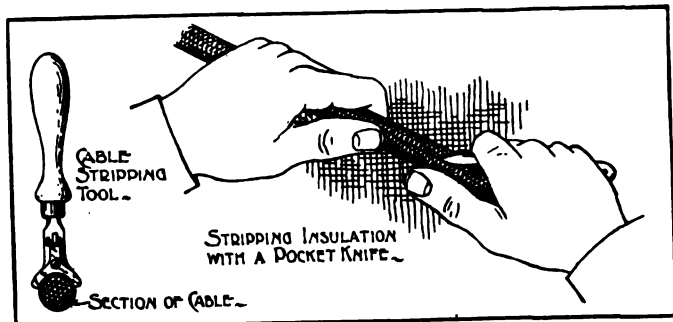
Special Cable Stripping Tool and Preparing to Strip Cable.
